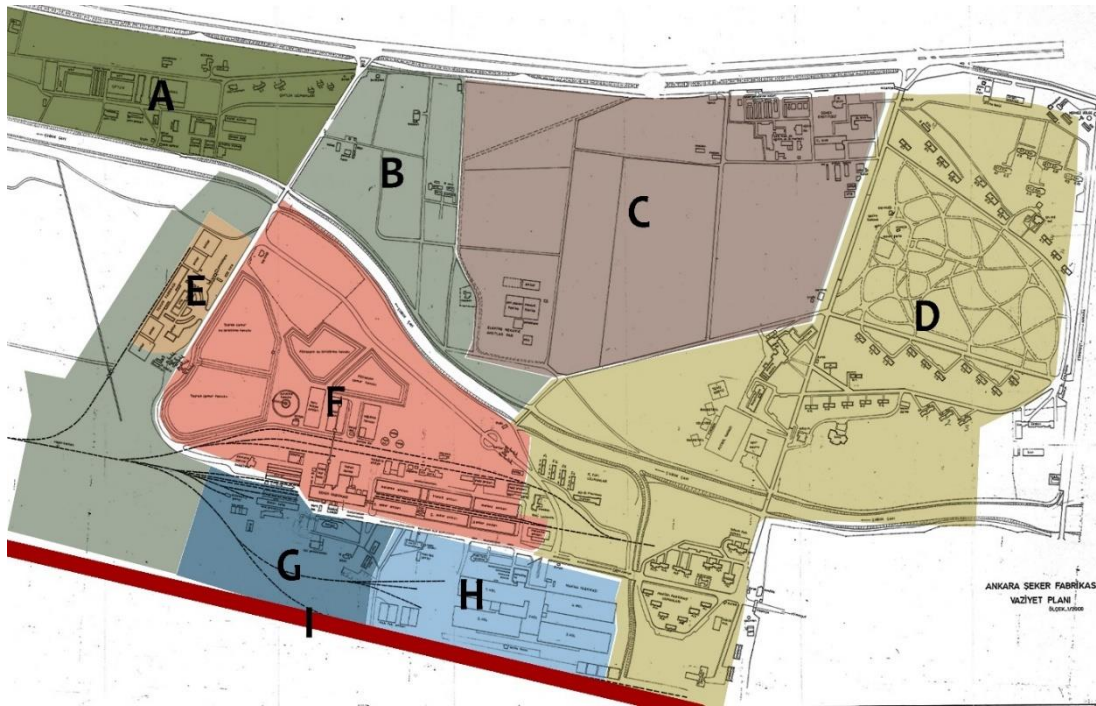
23: Ankara Sugar Factory Layout Plan (TOBB ETU Architecture Department Archive).
